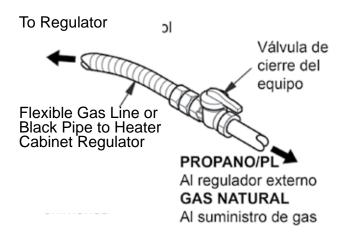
Attaching Flexible Gas Line to Equipment Shutoff Valve
